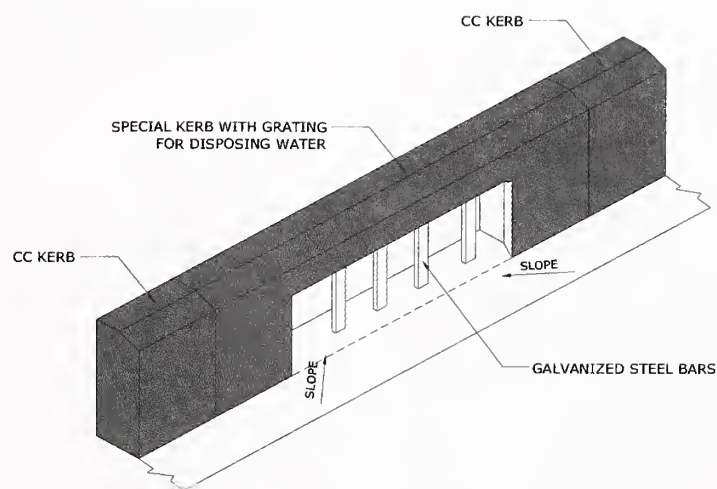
Isometric View of a Special Precast Concrete Kerb with a Grated Opening
